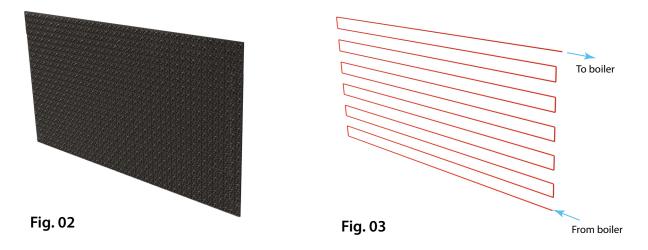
shows a layer of panels. The size here is 16' x 32' though assemblies of any size can easily be built. In actuality, the panel sections would be assembled on the flat and can be assembled on-site or off. Figure 03 shows the heating grid by itself.
